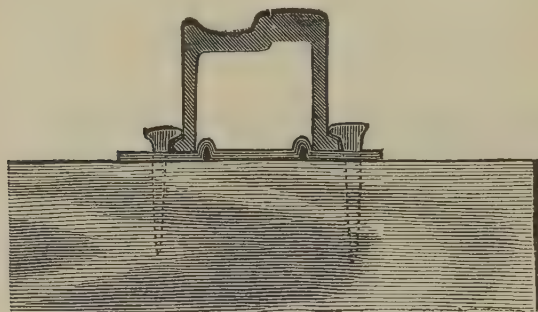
BOX GIRDER RAIL SPIKED TO TIE.
